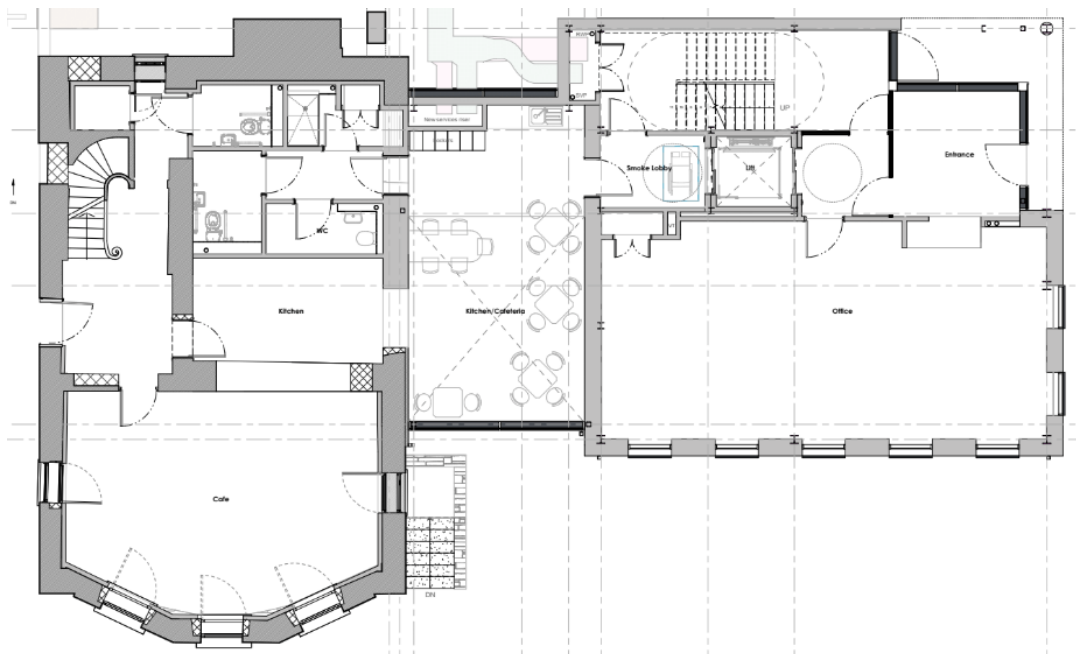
Nash Building Proposed Ground Floor © Gaunt Francis Architects
